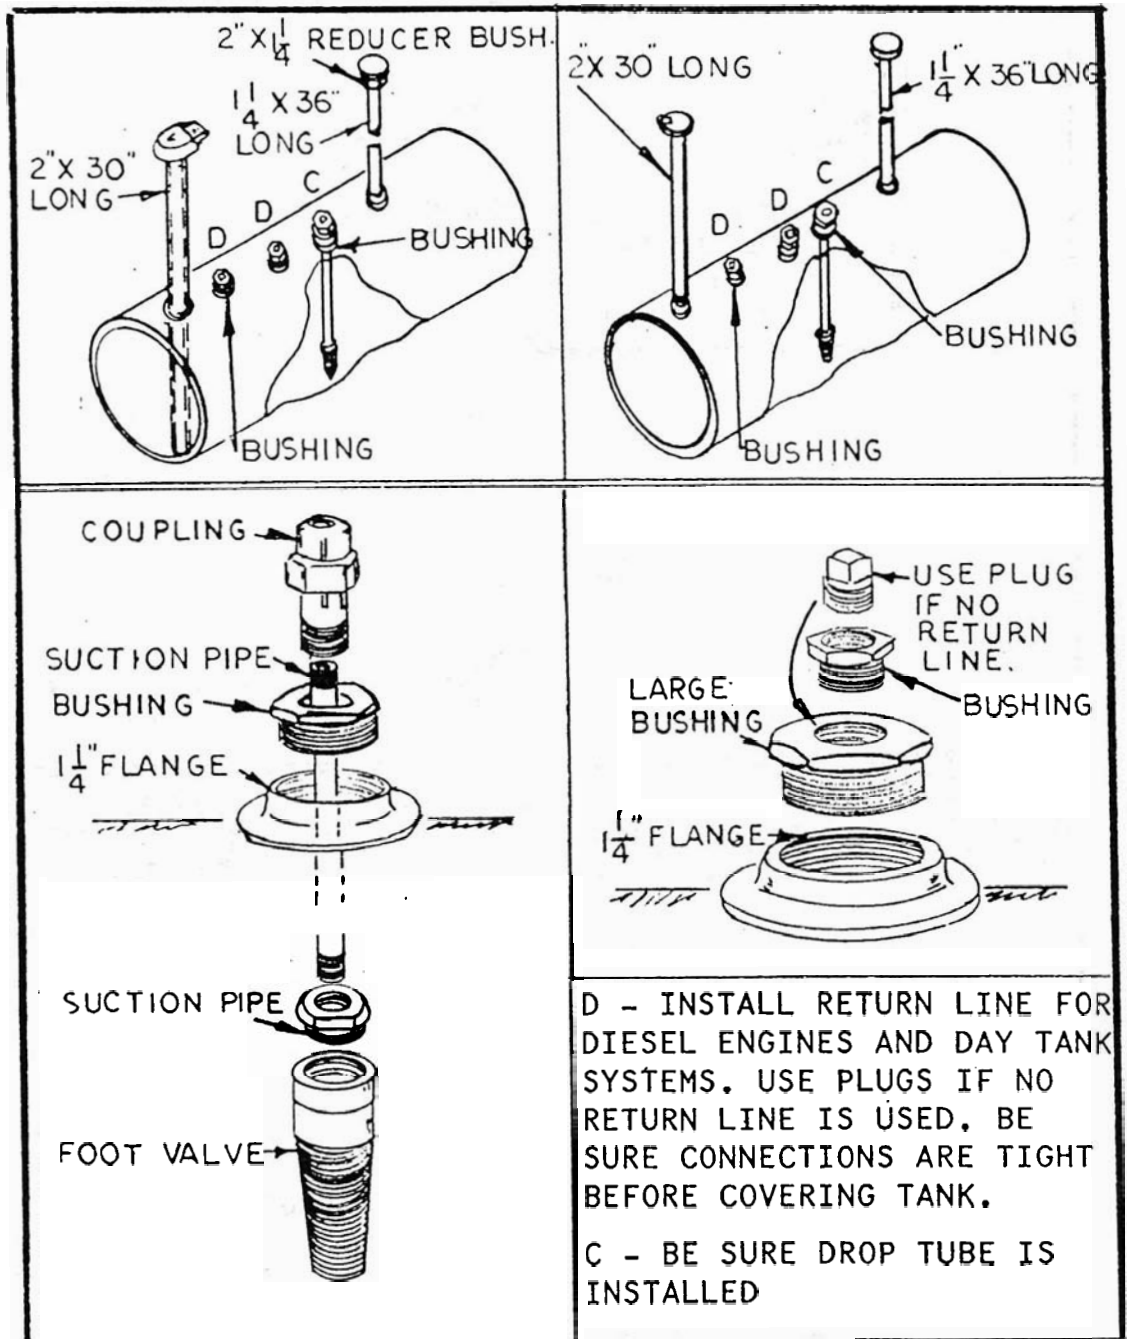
SUGGESTED FUEL TANK FITTINGS
